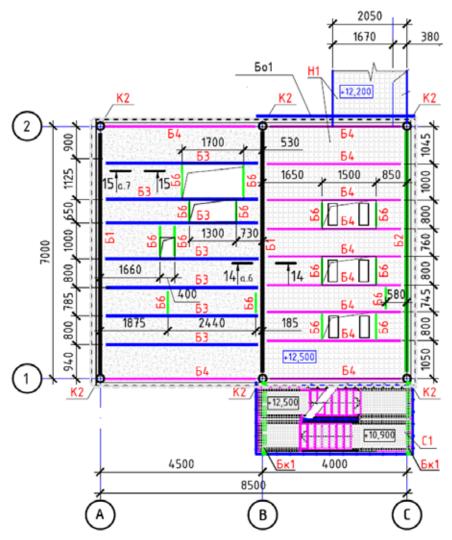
Fragment of the layout of the structural elements of the working tower at elevation +12500
